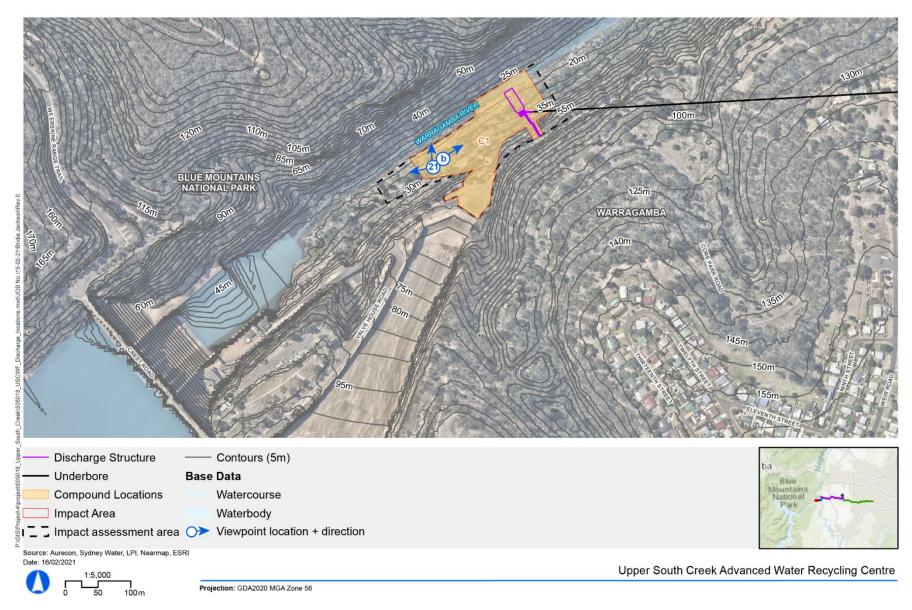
VP21 plan of pipeline outlet (discharge) structure and construction impact area
